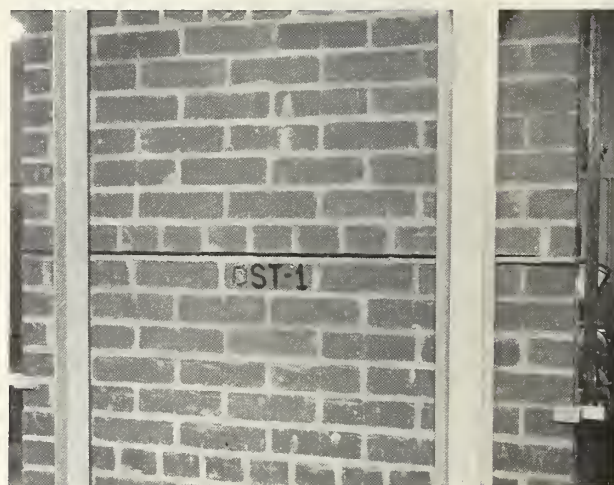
Flexural bond failure below header course in brick facing of composite wall.
